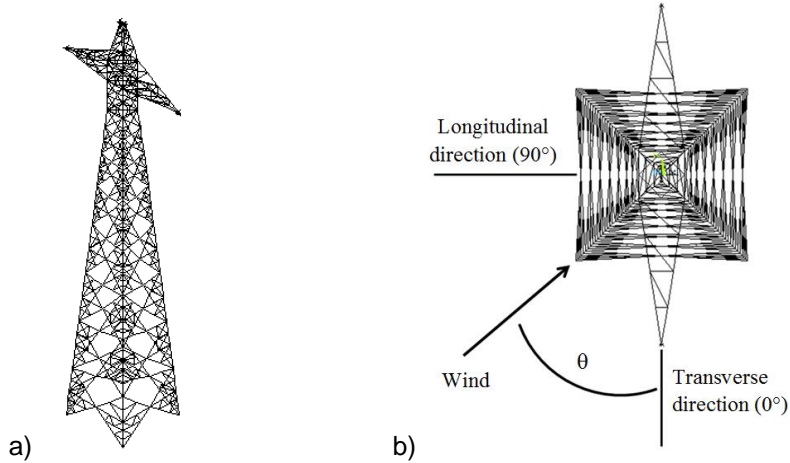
Self-supported transmission tower in a) isometric elevation view and b) plan view
